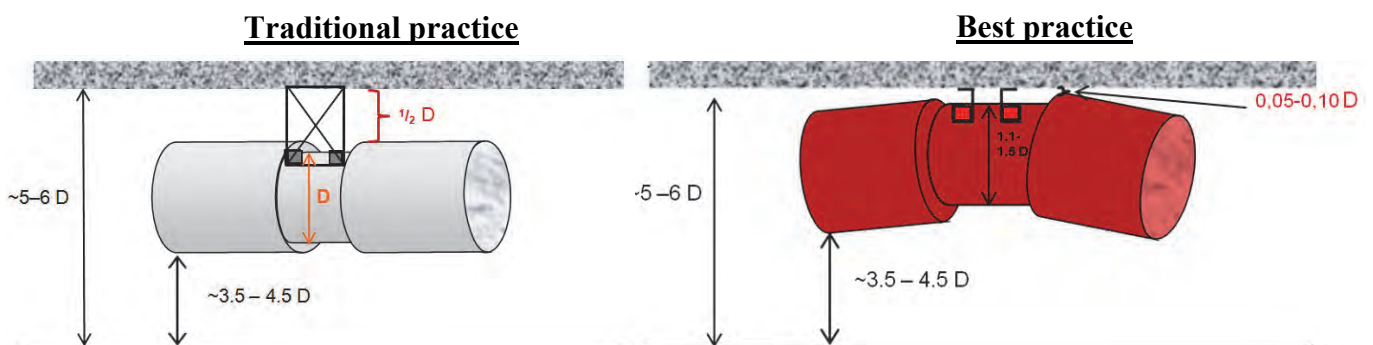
Installing maximum size Banana Jet[®] close to the ceiling
